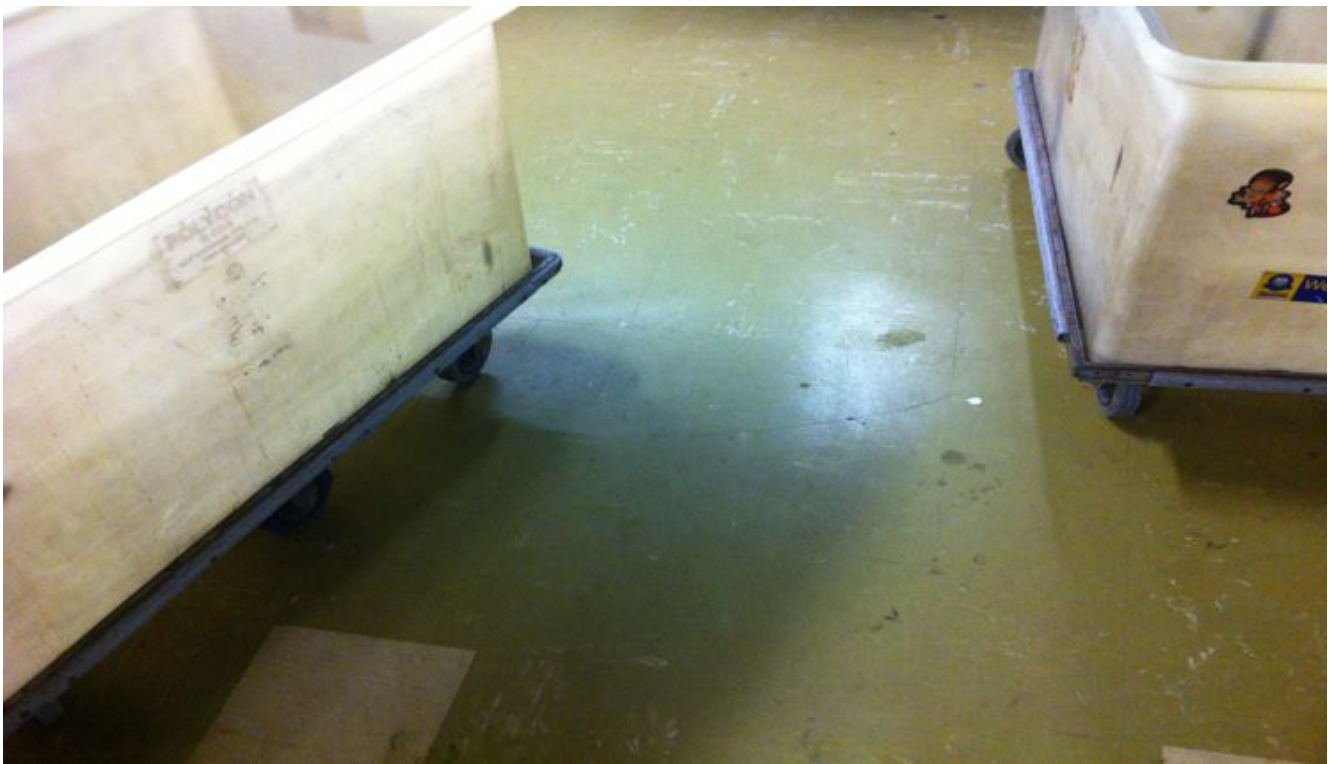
Vinyl floor tiles containing asbestos within the Laundry Room on Level 7 of the North Wing – Menzies Hotel.
